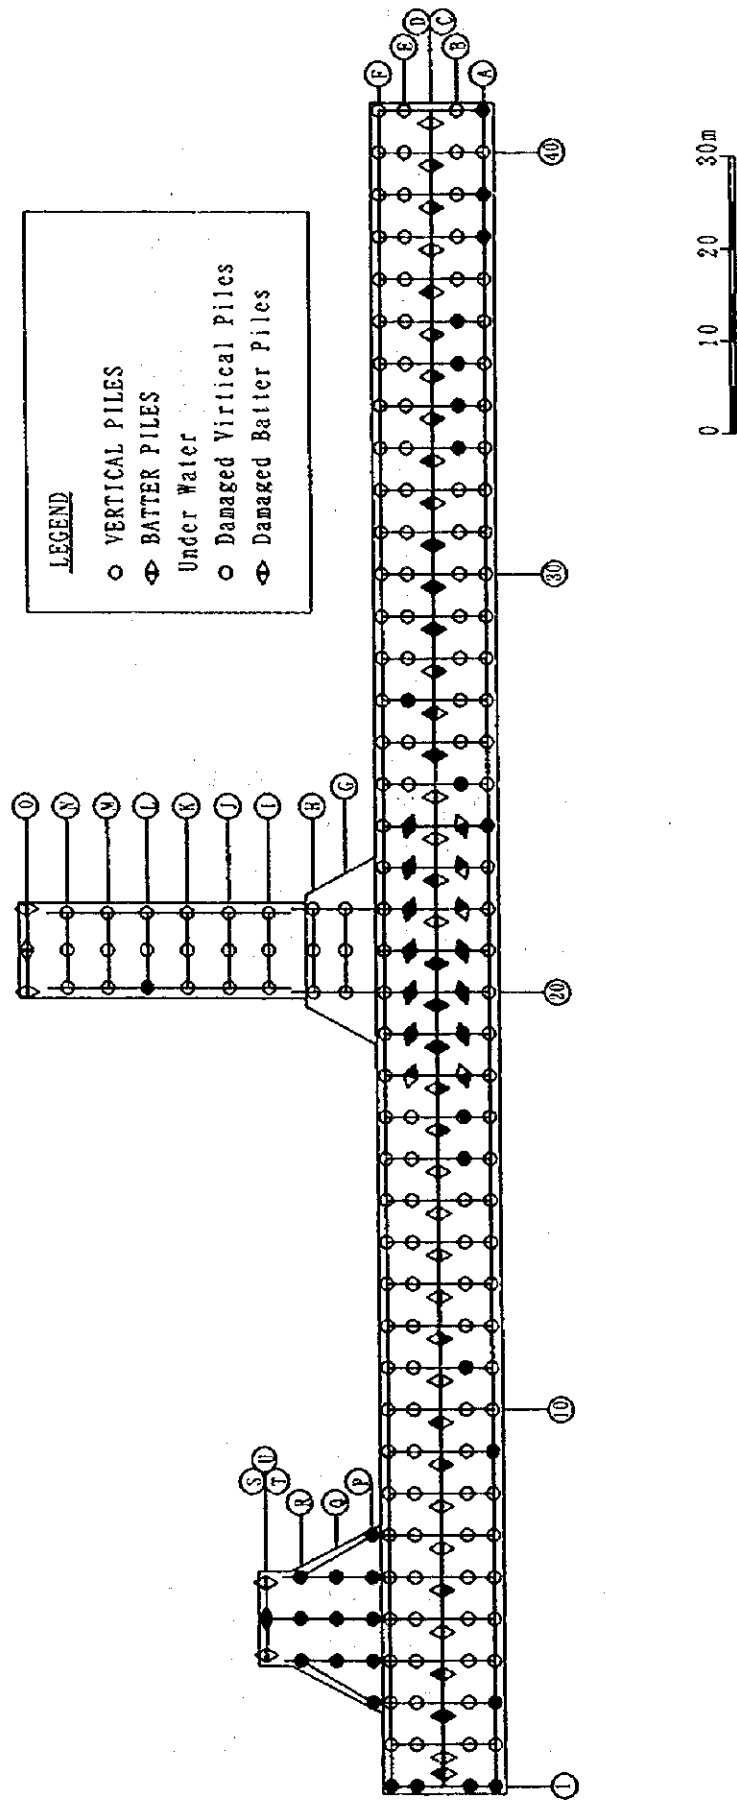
Location of Piles Damaged in Underwater
